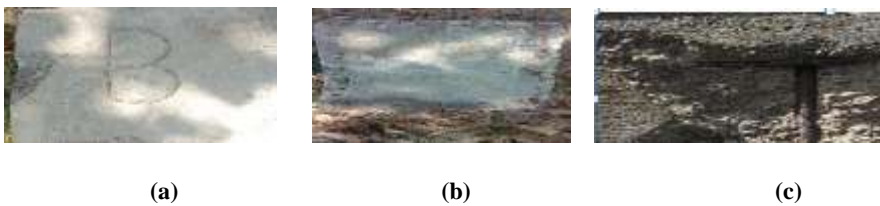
Bacterial concrete slab before and after 365 days of immersion in sea water
